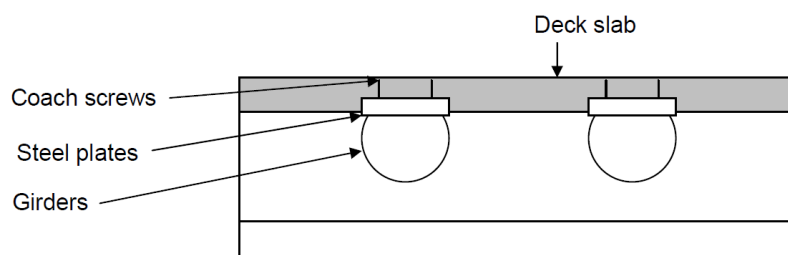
M-Lock typical cross section (Rocla, n.d.)
